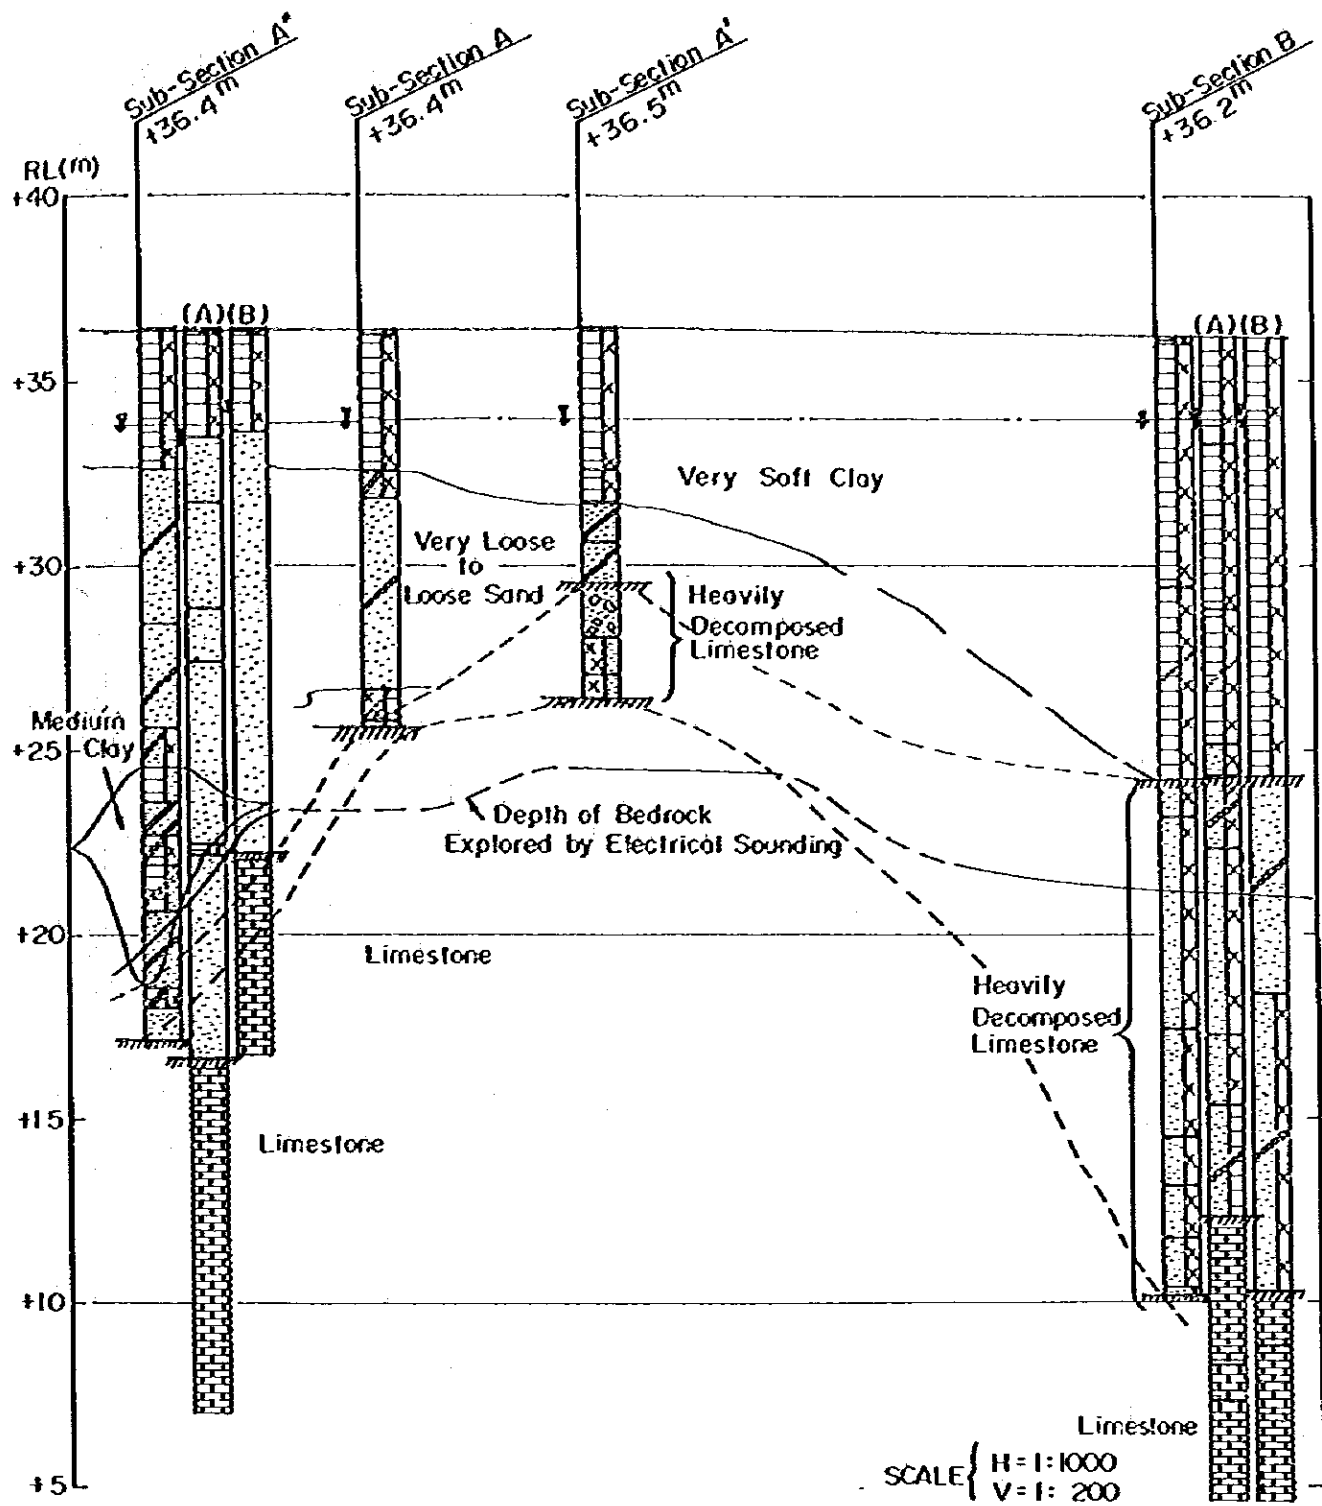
Soil Profile, Cross Section at Pilot Test Area
